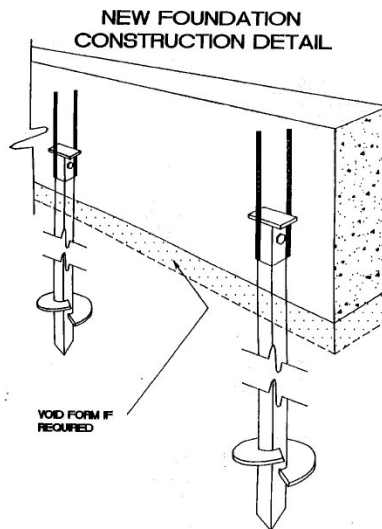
New Construction Bracket Embedded within a Reinforced Concrete Grade Beam
